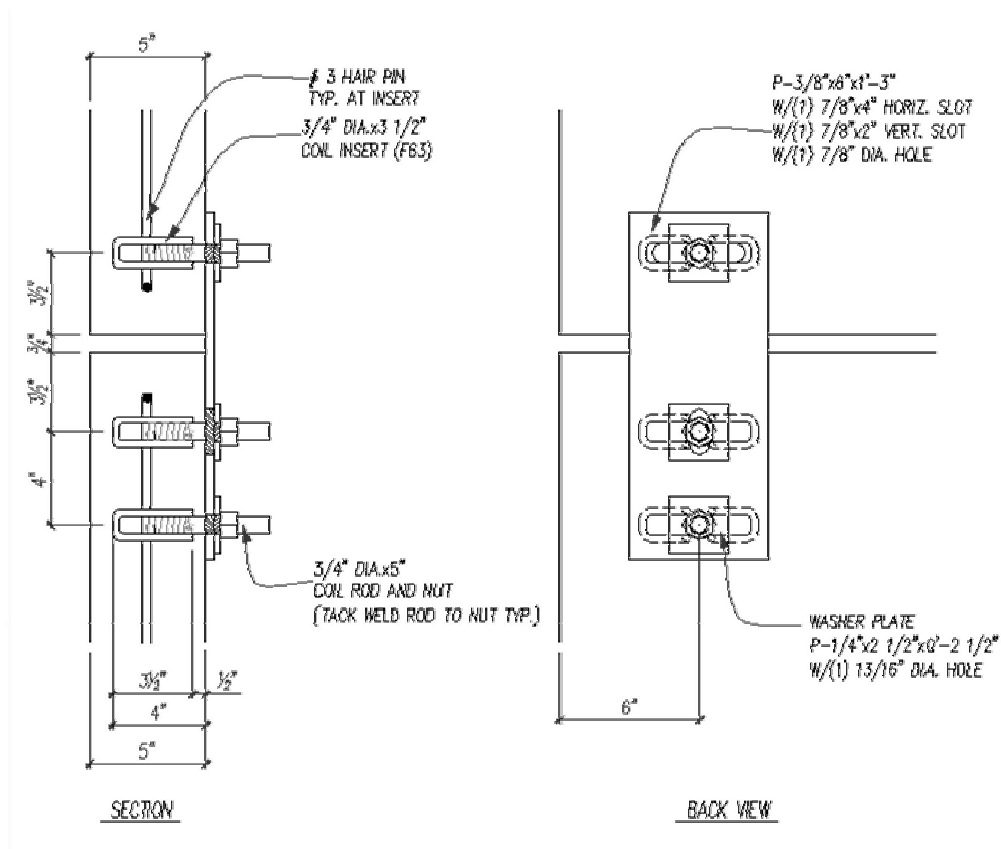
Section (left) and back view (right) of the top column cover connection
